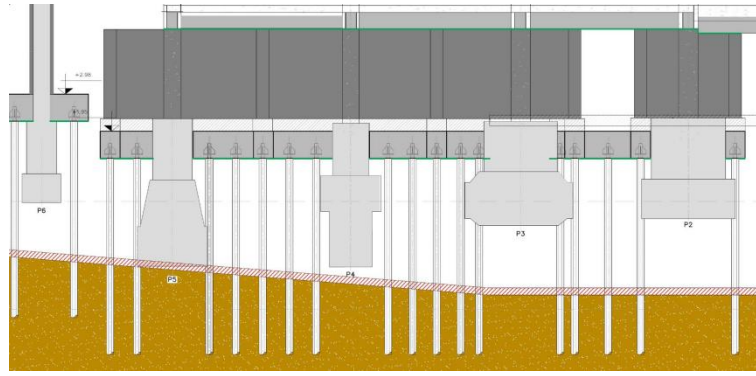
Partial elevation of the structure's underpinning and the lower level of the vehicle tunnel
